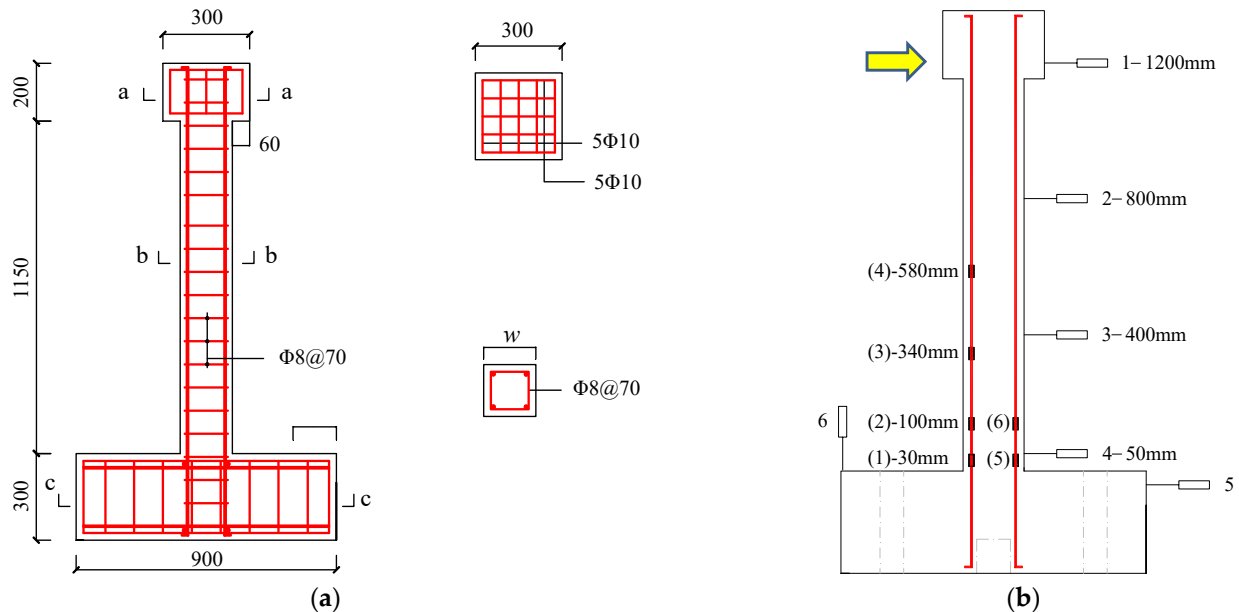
Details of specimen and measurements. (a) Dimensions of the specimens; (b) Measurements.
